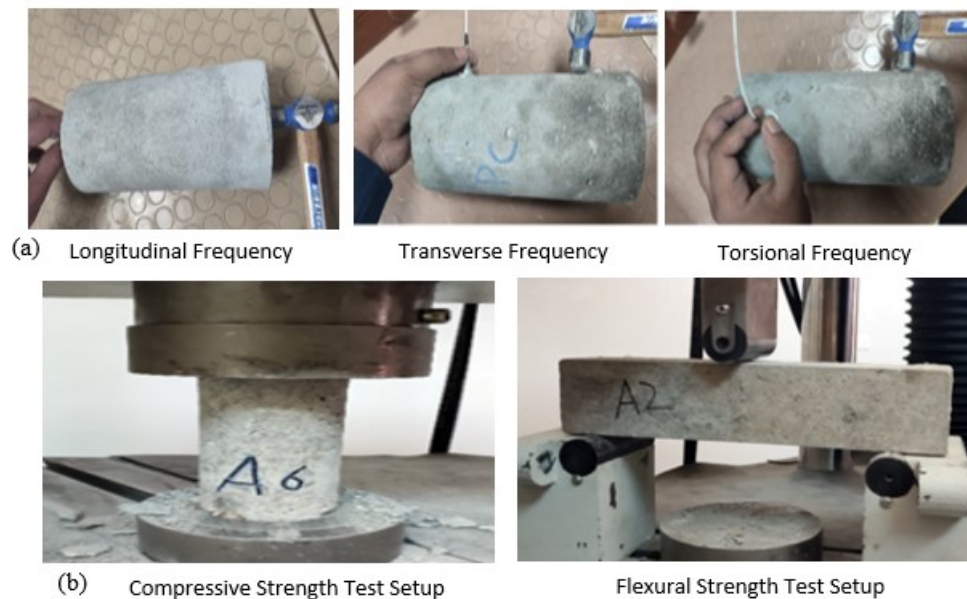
Test Setup (a) Dynamic Test (b) Mechanical Test Setup
